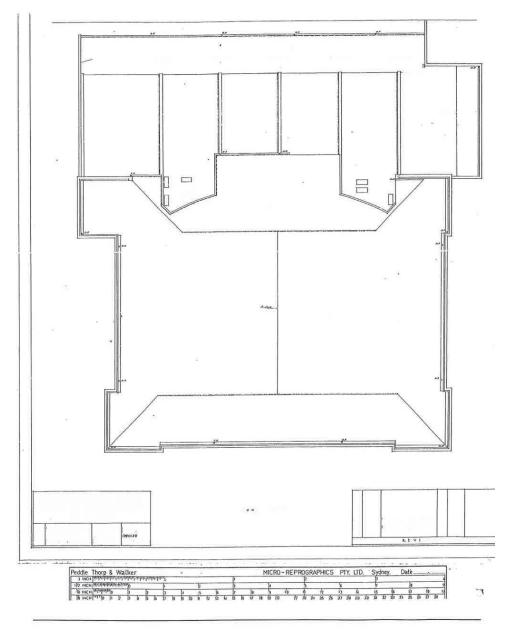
Roof plan, 1926 (Source: Conservation Plan 2000)
